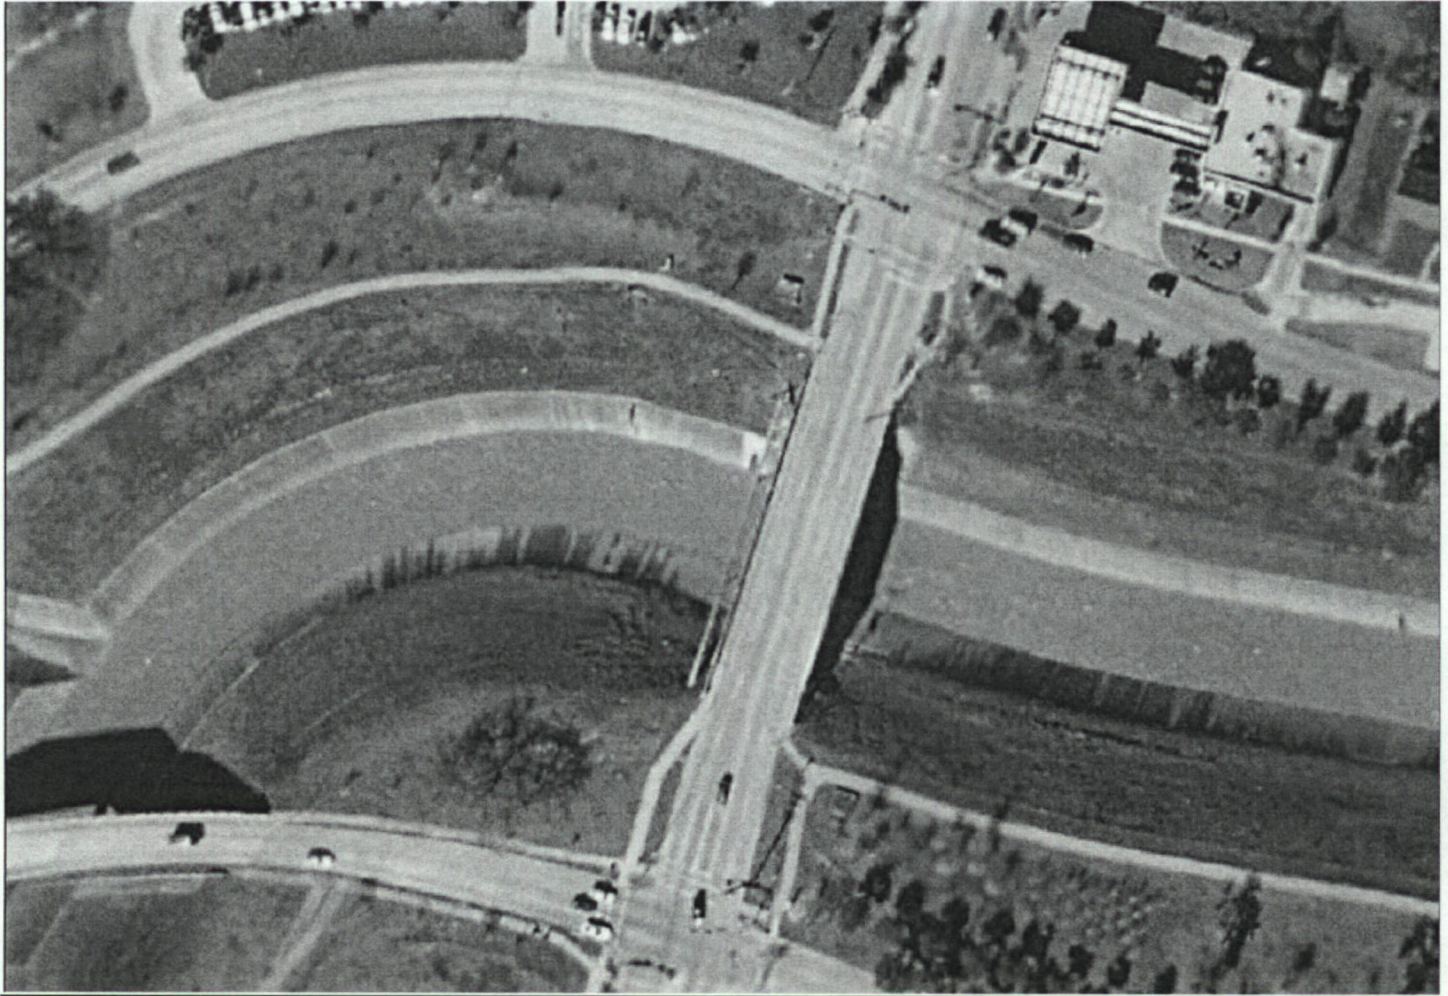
Aerial photo of Almeda Road Bridge (source: Google Earth)
